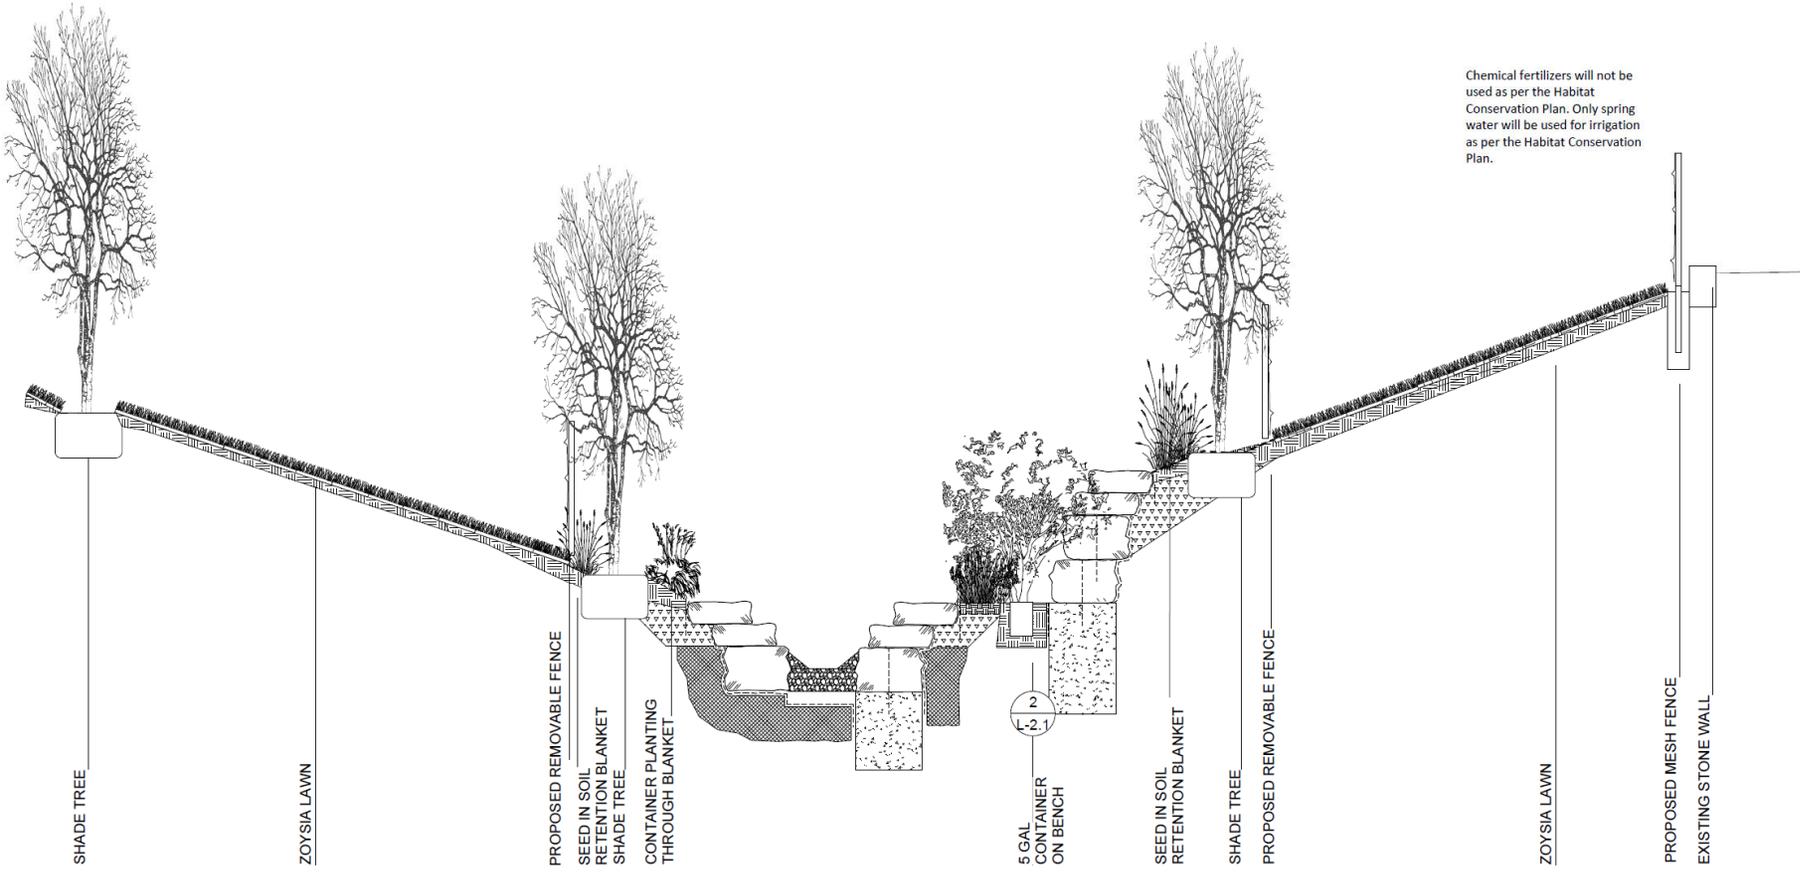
Exhibit B: New Channel, Storm Drain Redirection, and Structural Support
